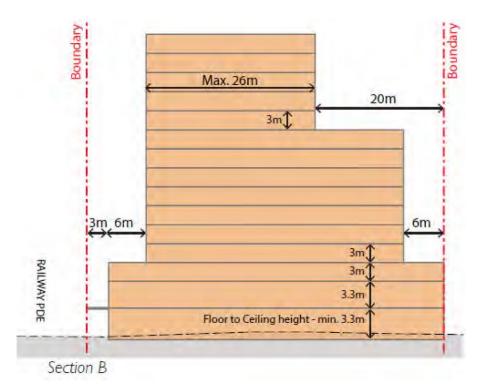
North-South Section of Site Building Envelope
